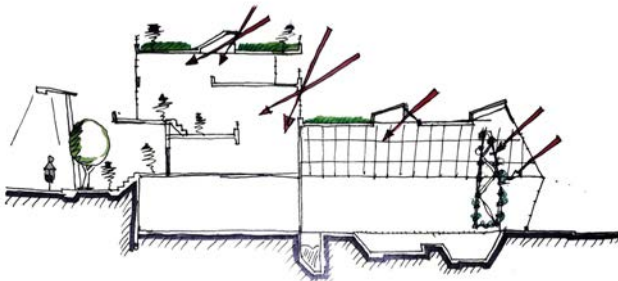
Greenhouse section sketch 4 (Author 2018)
